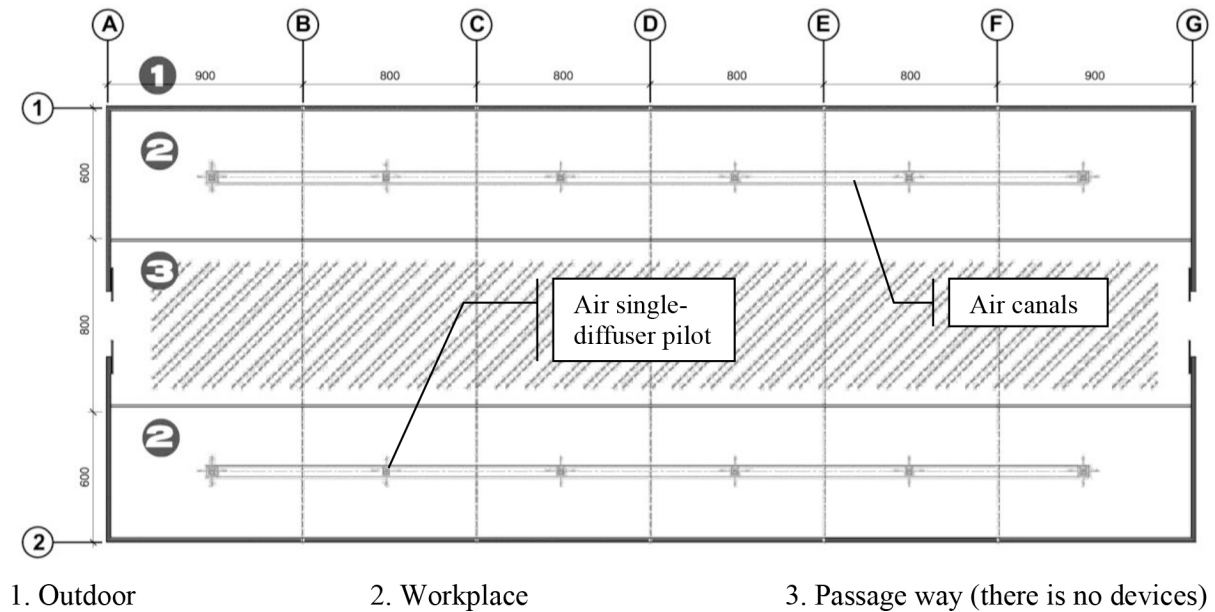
Ground Floor Plan of Hygienic Production's Plant in Kave Industrial Area (Case Study).
